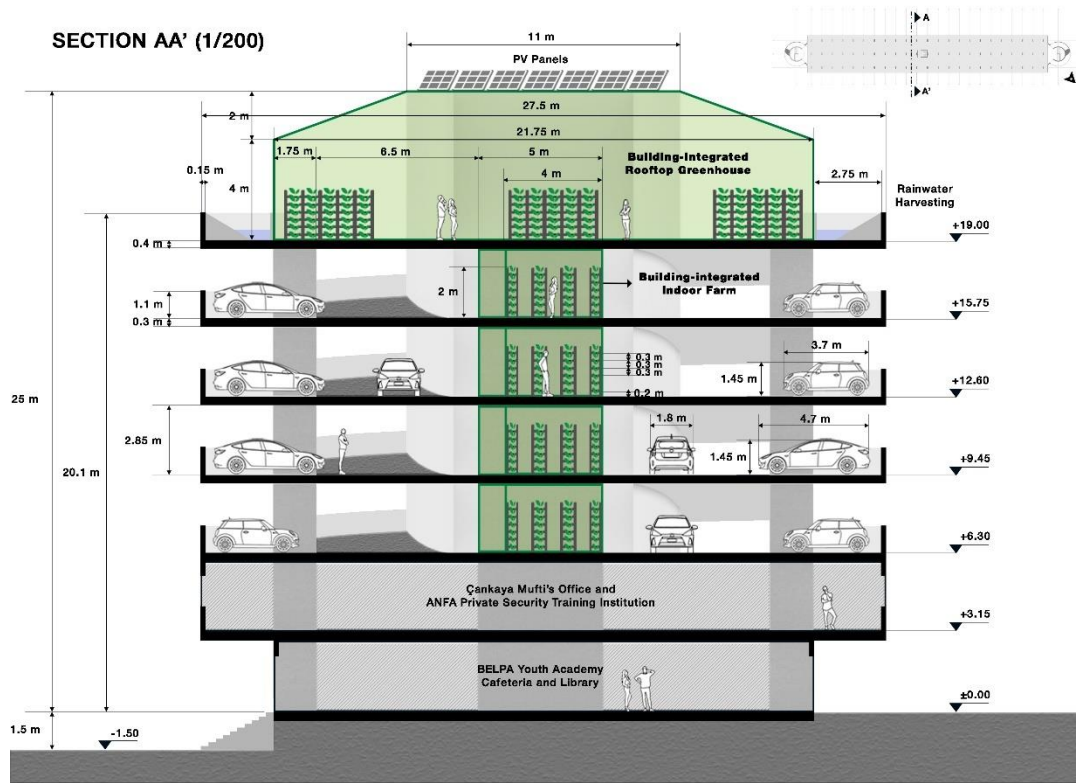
Proposed use of the car parking floors and rooftop of the building (Section AA').
